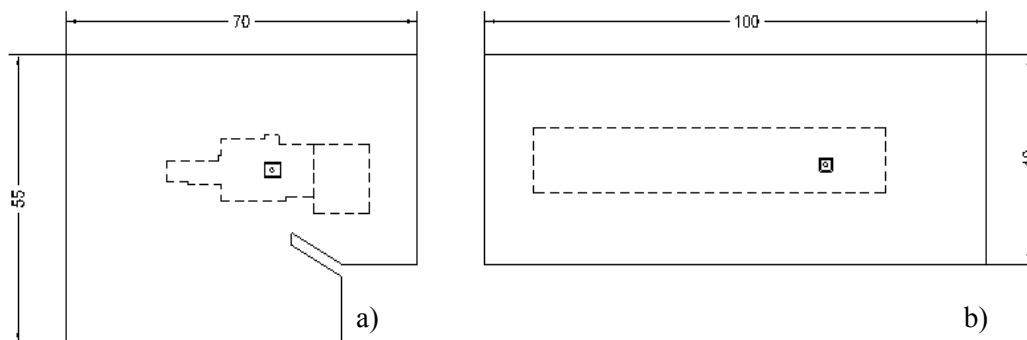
a) Icelandic drilling platform, and b) Salvadorian drilling platform
